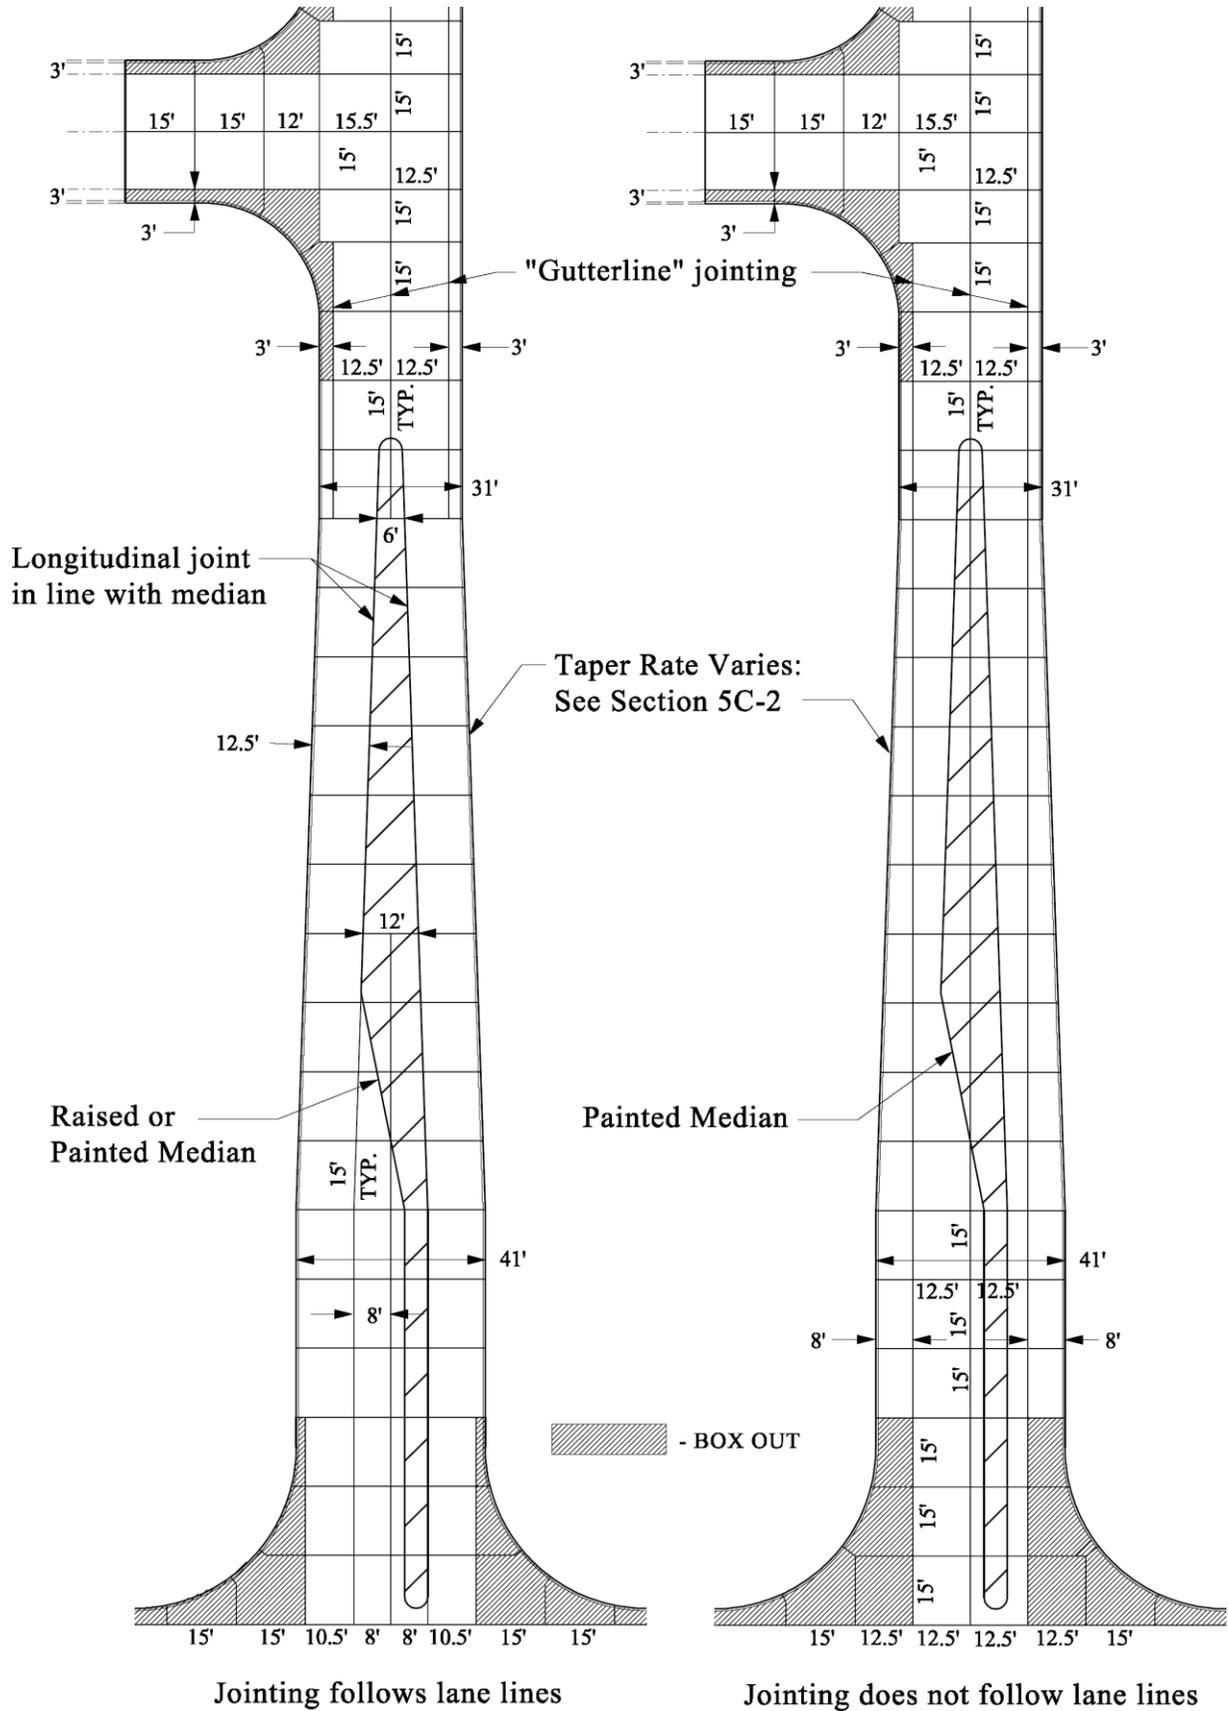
G-3.08: Gutterline Jointing - Widening One Side (31 Foot to 41 Foot)
